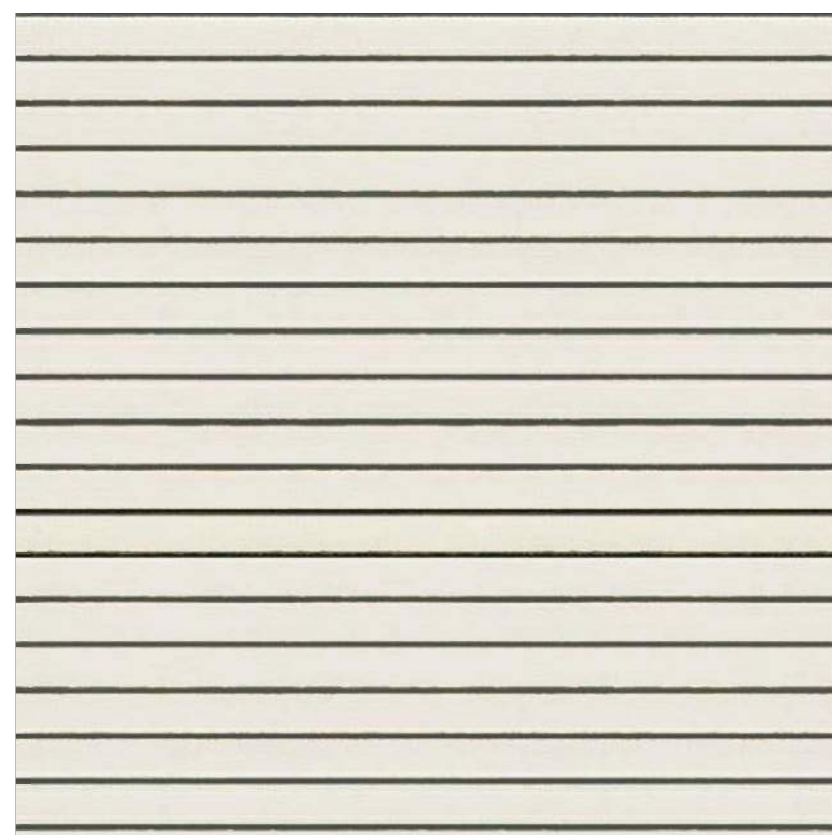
" WOOD CLAPBOARD SIDING TO BE REPAIRED AS NECESSARY AND PAINTED AT EXISTING CONSTRUCTION
